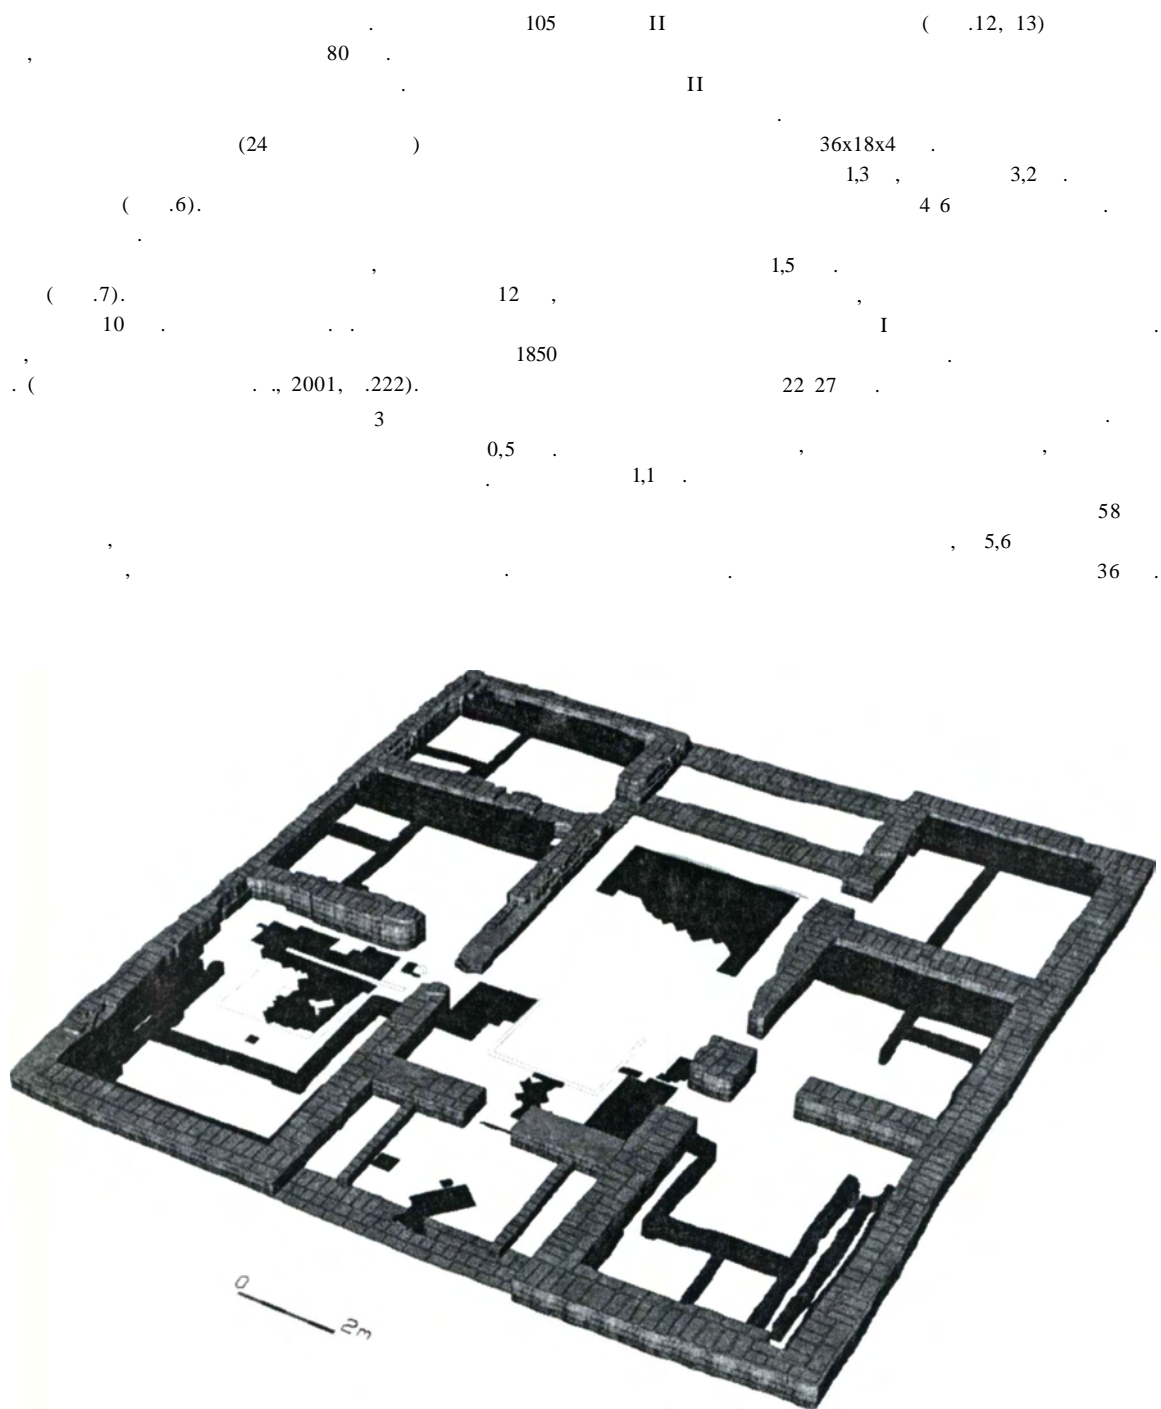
Building at XVth dig out, the computer aided general layout of the 1<sup>st</sup> construction period structures.
